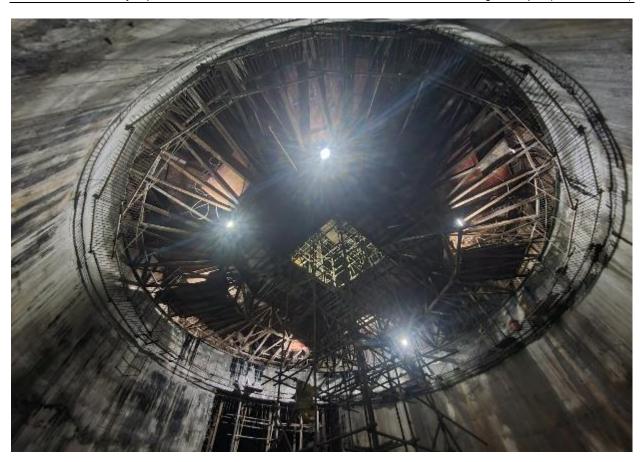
Formwork for concreting works of side walls of Surge shaft
